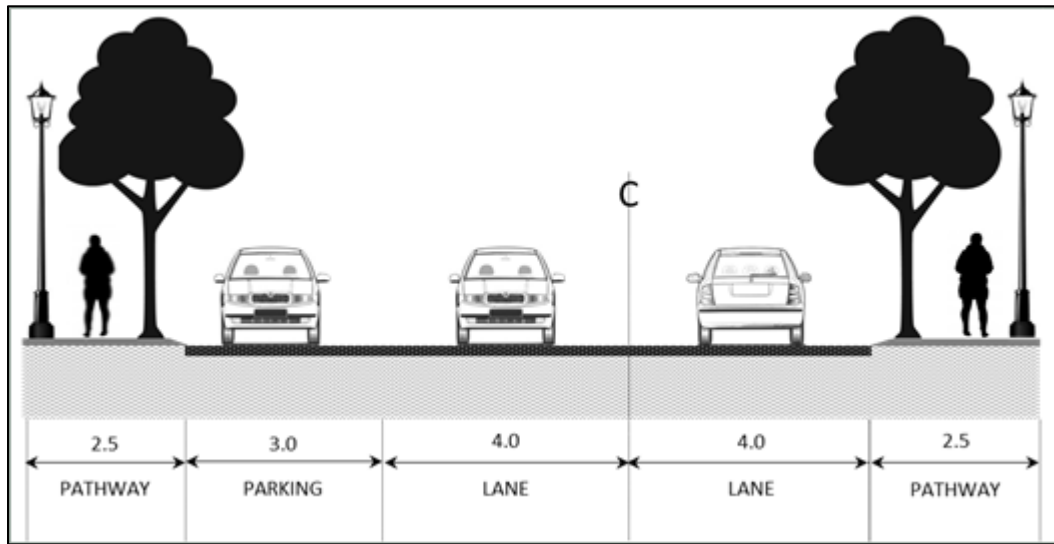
TYPICAL ROAD CROSS-SECTION
